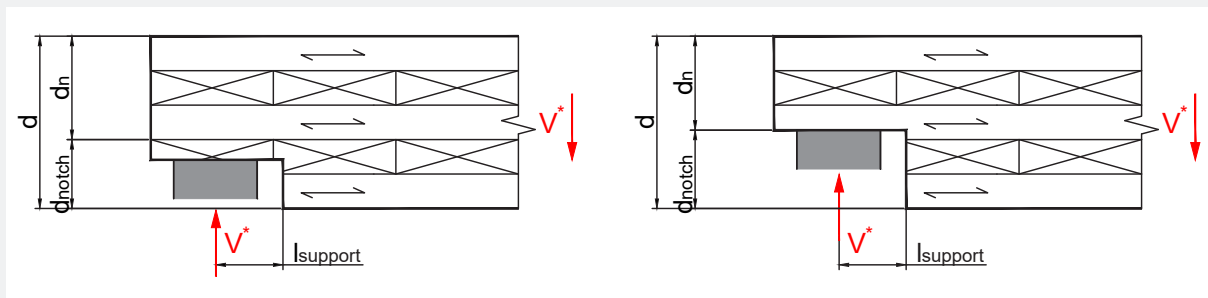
Examples of notched Cross laminated Timber (CLT) members on flat and effective beam depth d_n to be considered in the verification.
